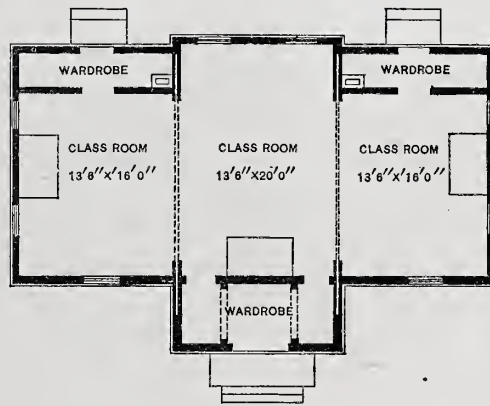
Plan of Schoolhouse, by Messrs. Smith & Howe.—Scale, 1-16 Inch to the Foot.
